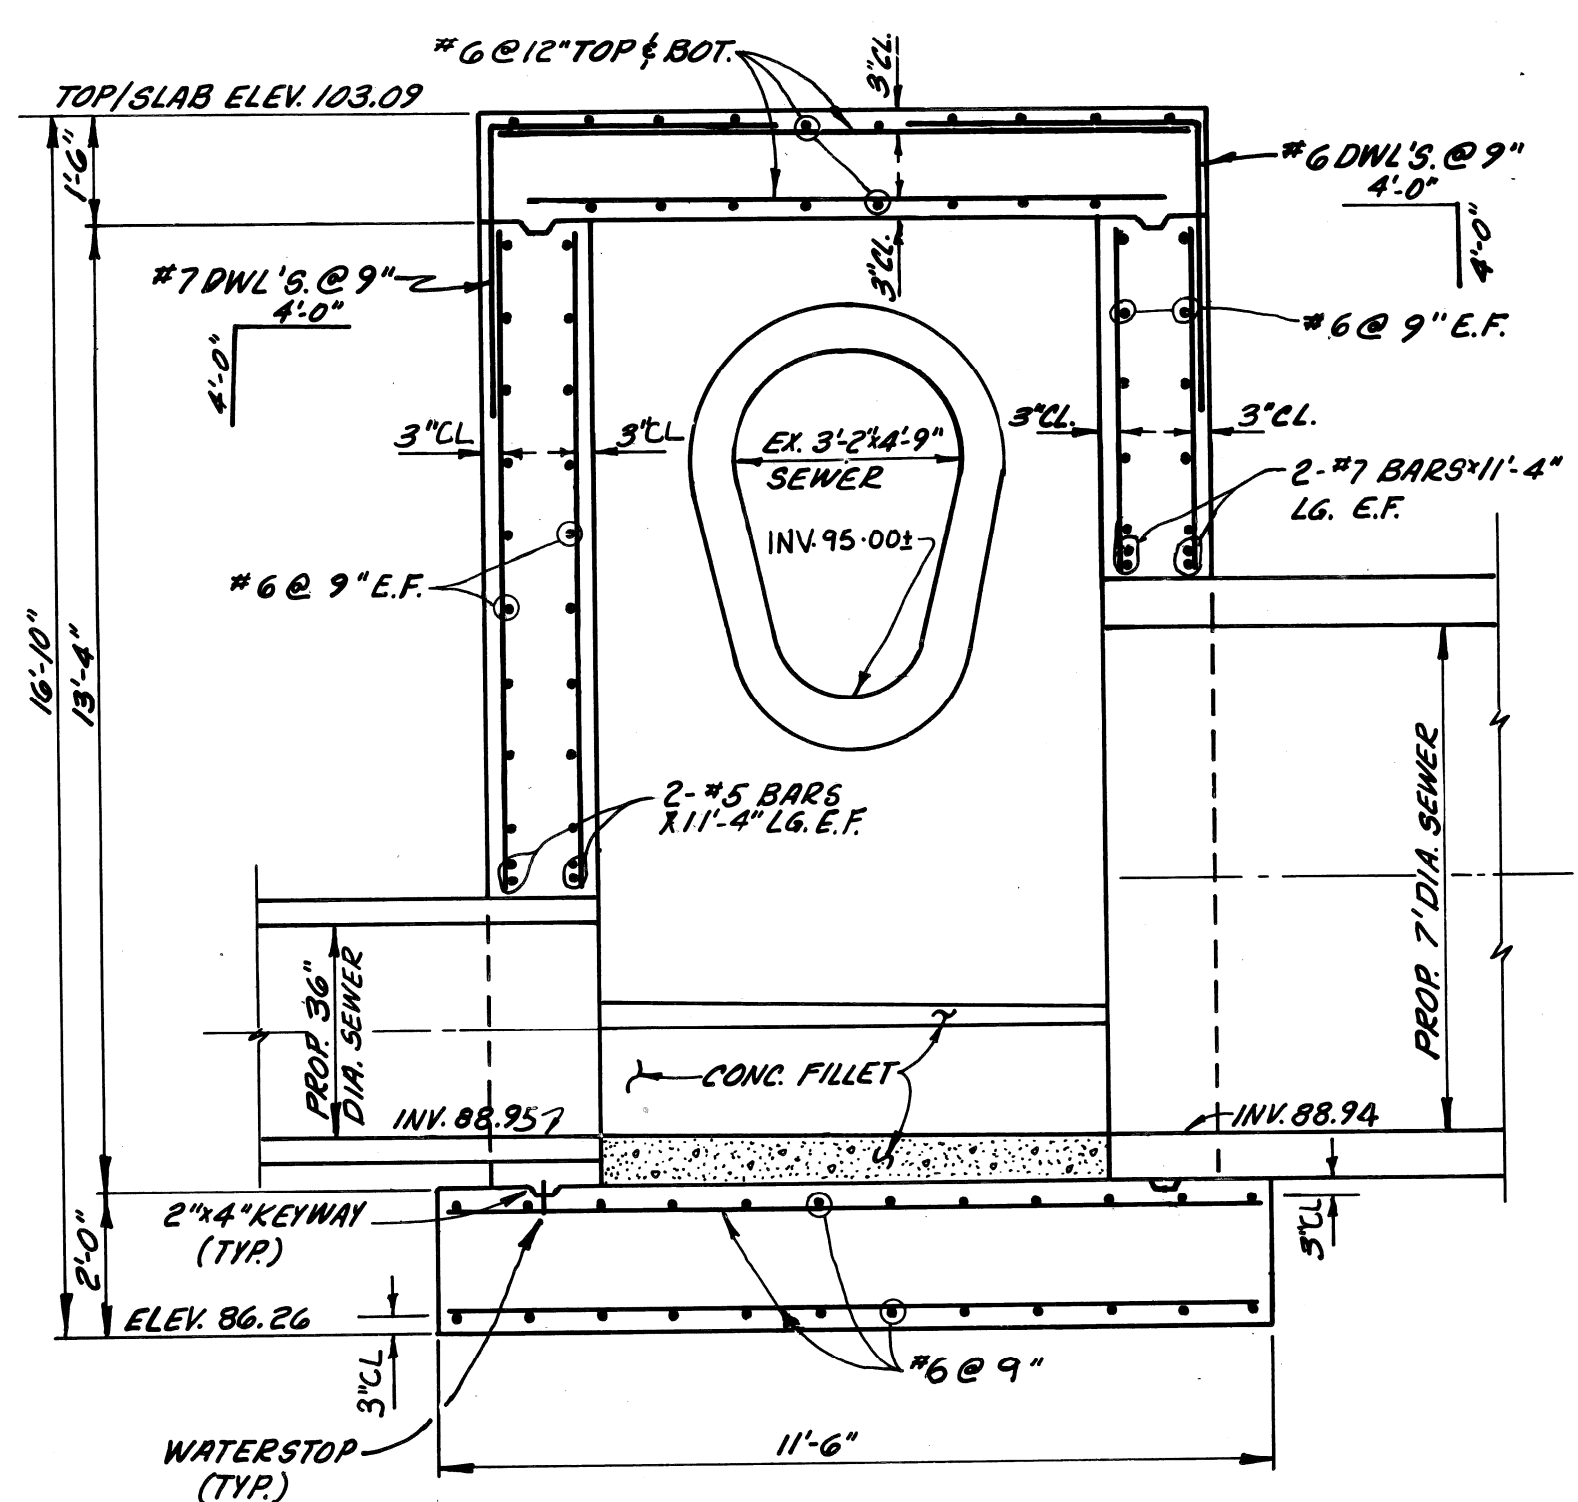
DETAIL OF ADDITIONAL REINFORCING STEEL AROUND EXISTING SEWER
